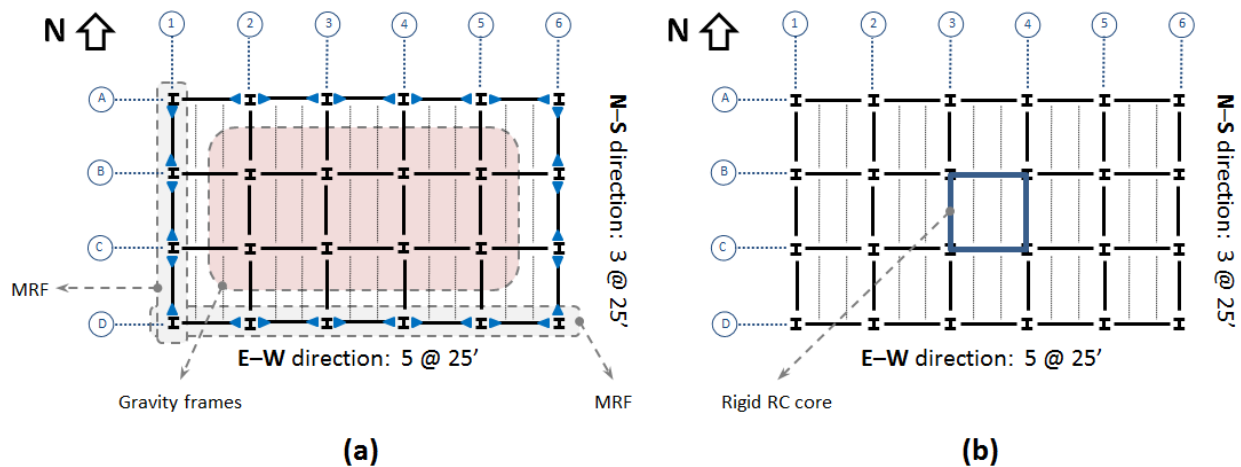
Plan view of 10-story office building with (a) perimeter moment resisting frames and (b) interior RC rigid core. Locations of fixed beam-column connections are denoted by blue triangles.
